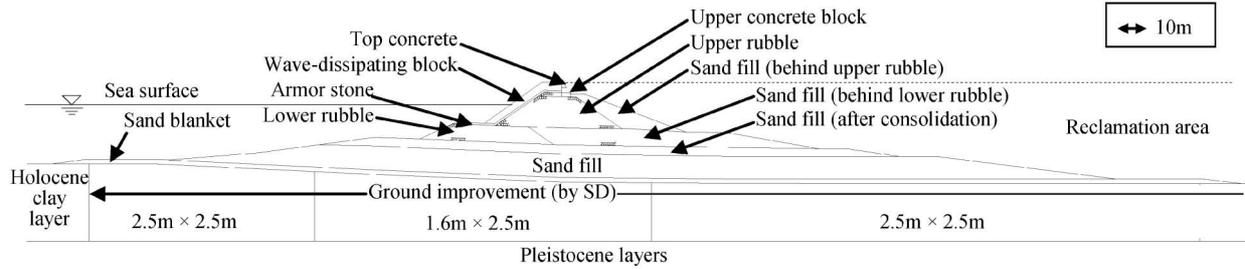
Typical cross section of the rubble mound type seawall (with wave-dissipating block)
